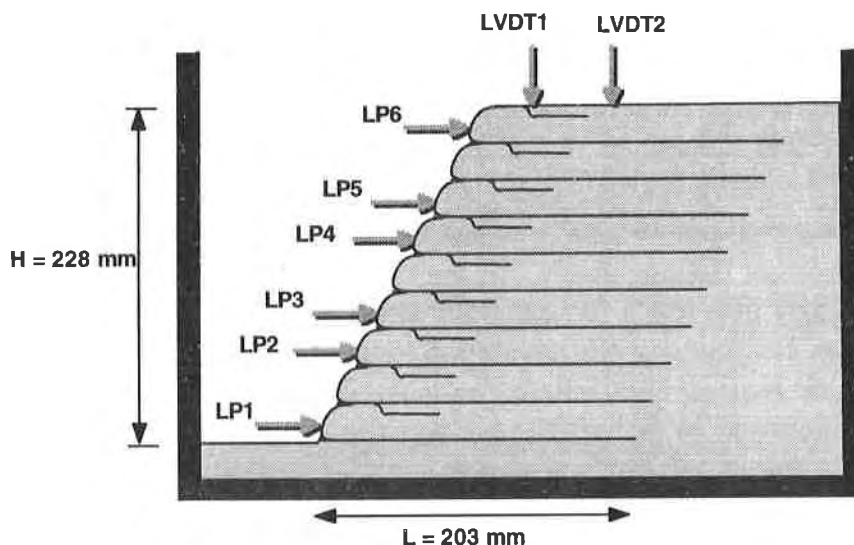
Centrifuge model with 2.5 cm reinforcement spacing
